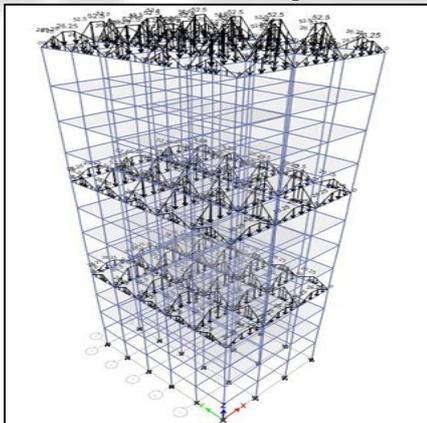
3D view of Frame with lumped mass at 4th, 8th & 12th floor
